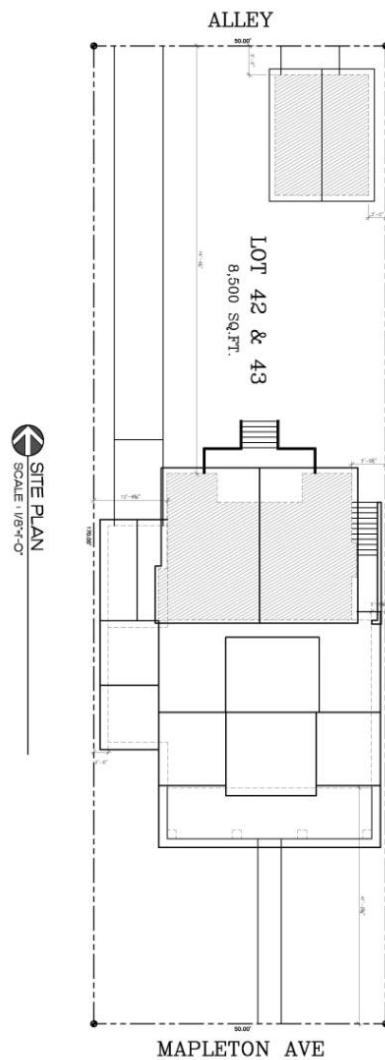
Proposed Site Plan, Dec.3, 2014 (right). Not to scale.
